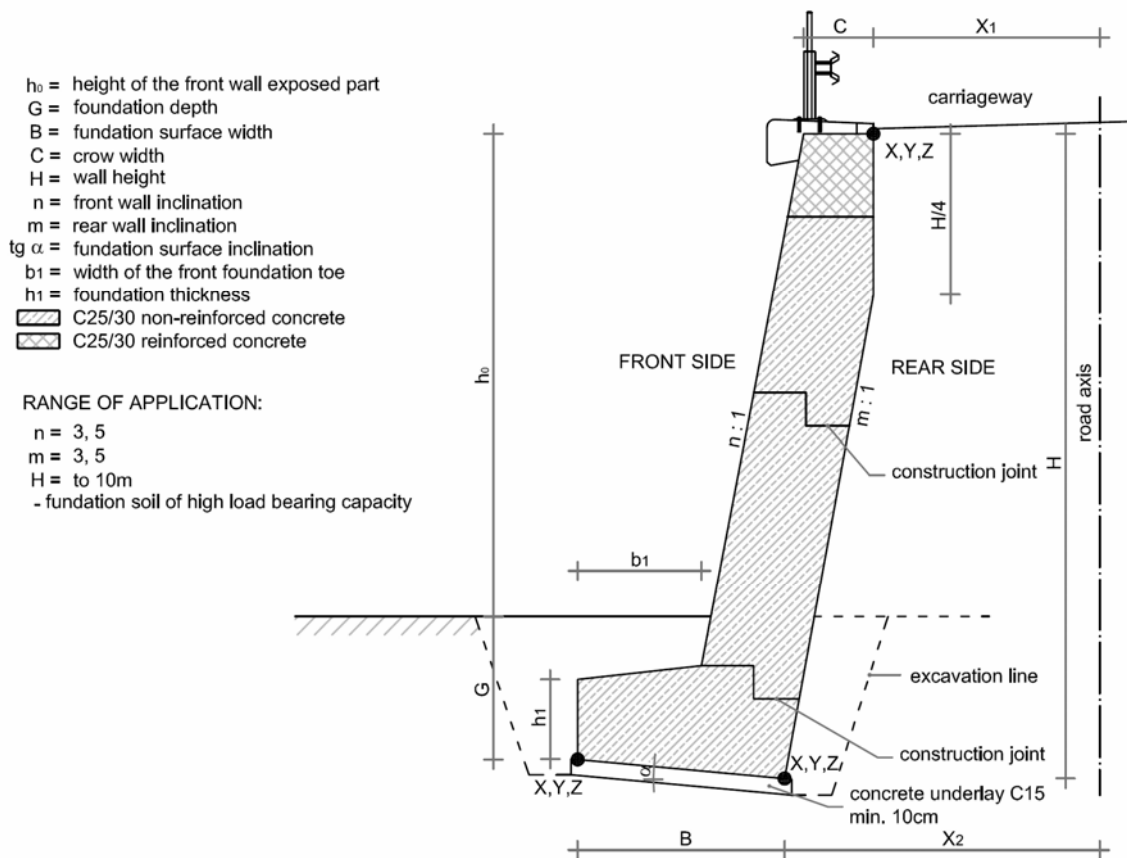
Concrete gravity supporting wall with an inclined rear wall, including staking out data
